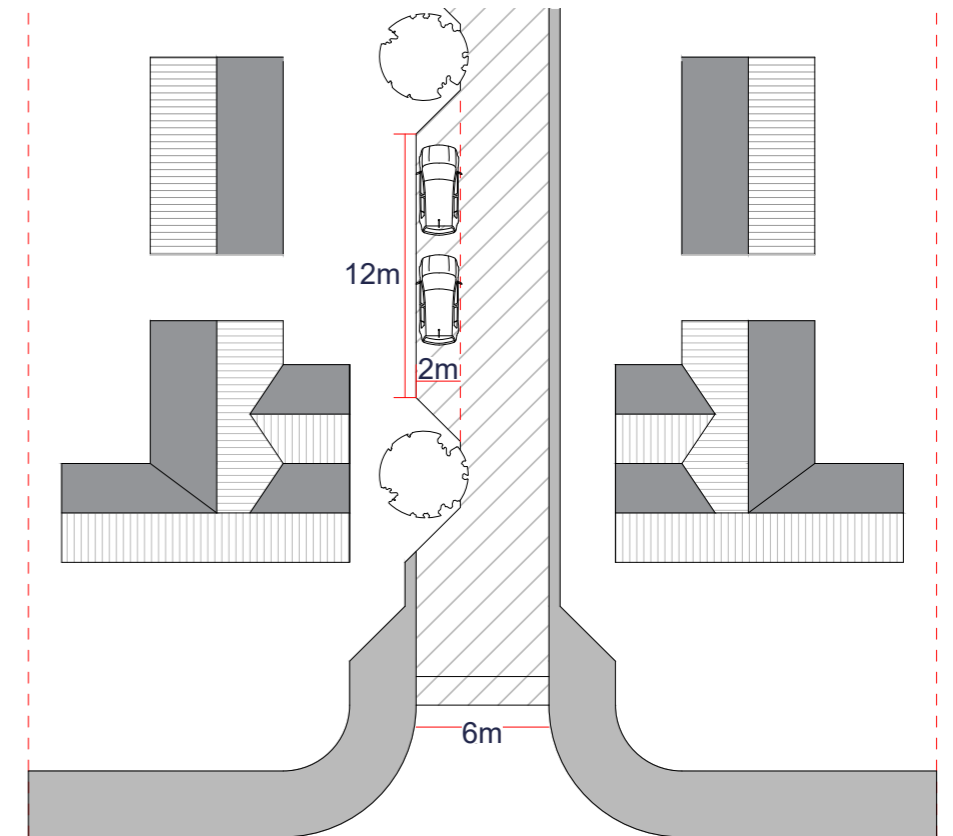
Type F Minor Access Street Plan. (Not to scale)
